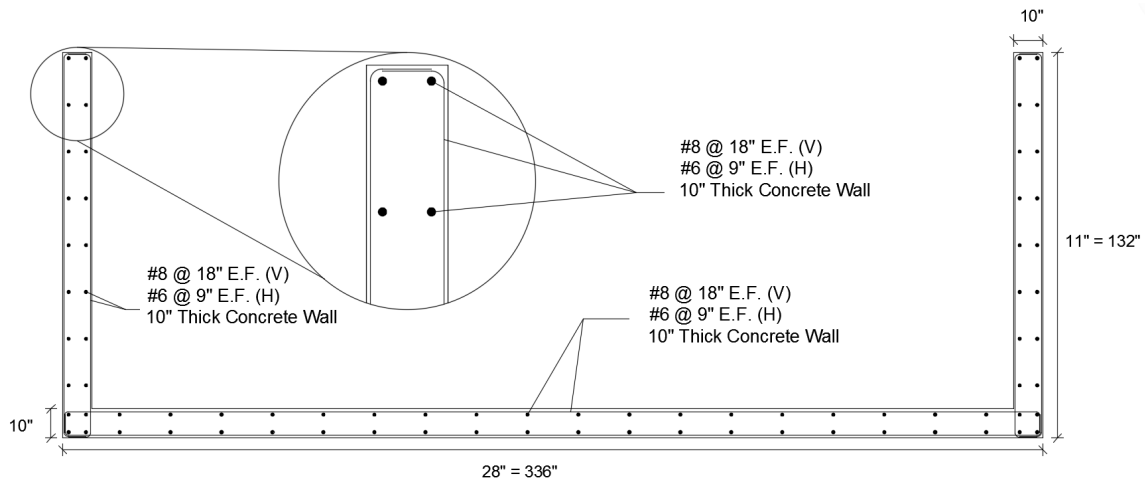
Original Elevator/ Mech. Room shear wall cross-section at the ground floor level
